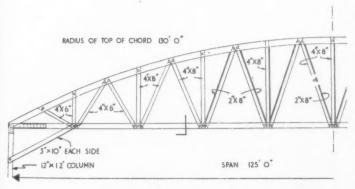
125-ft. bowstring trusses at a plywood plant, with, above, detail of bottom chord connection (Engineer: R. Guertin.)
